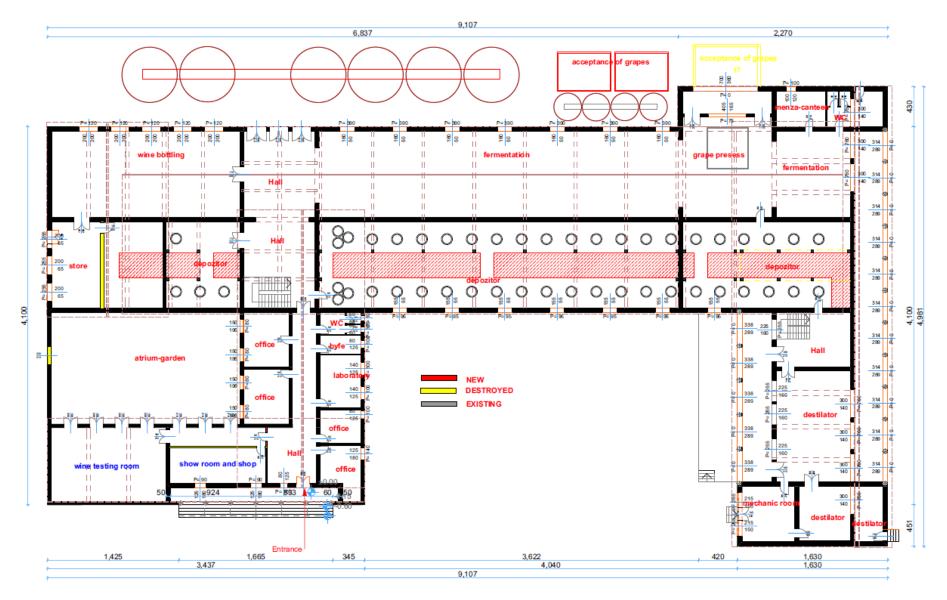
Reconstruction of Ground floor of winery "Bodrumi i Vjeter" of N.T.P. Haxhijaha in 2016
